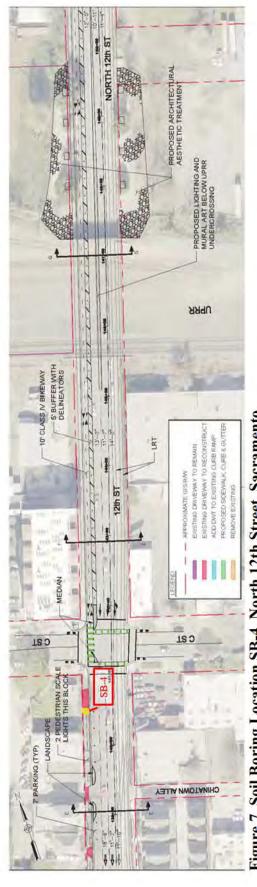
Soil Boring Location SB-4, North 12th Street, Sacramento
